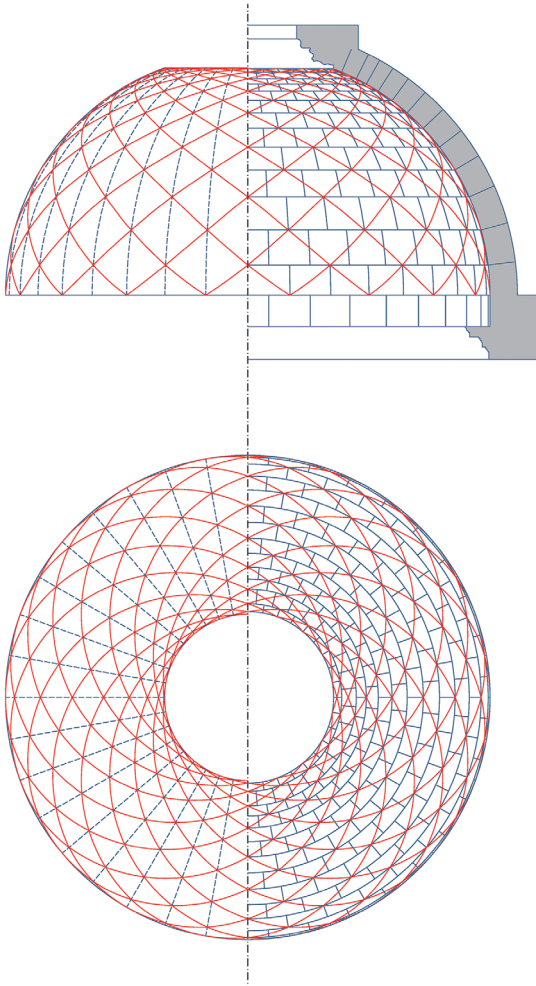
Ground plan and cross-section of the dome's geometric pattern (left) and its translation (right) into the dome's constructive elements (drawing by the author)
